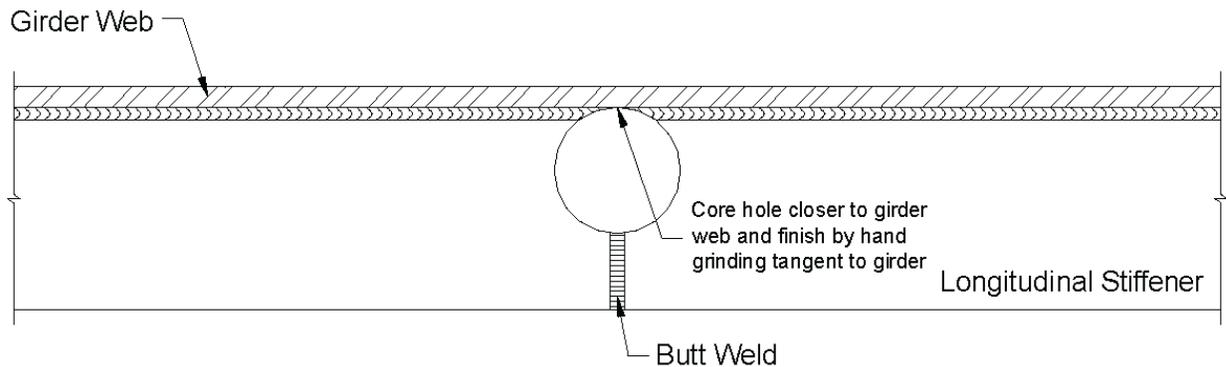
Work plan of longitudinal butt weld retrofit.
